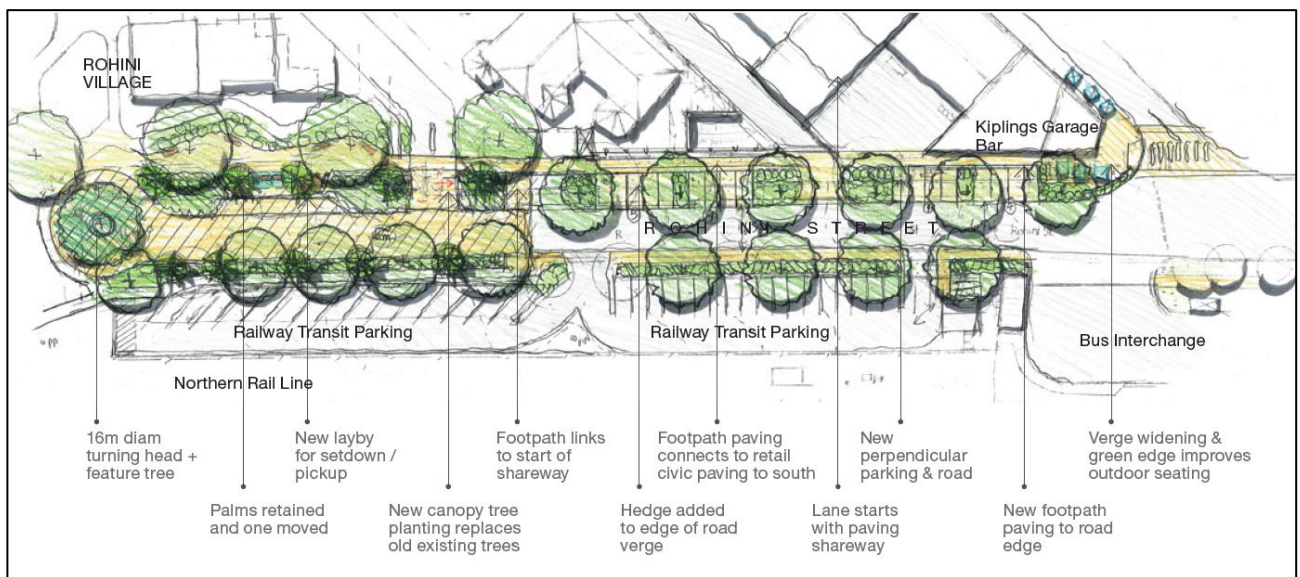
Potential upgrades Rohini Street, subject to a Planning Agreement
